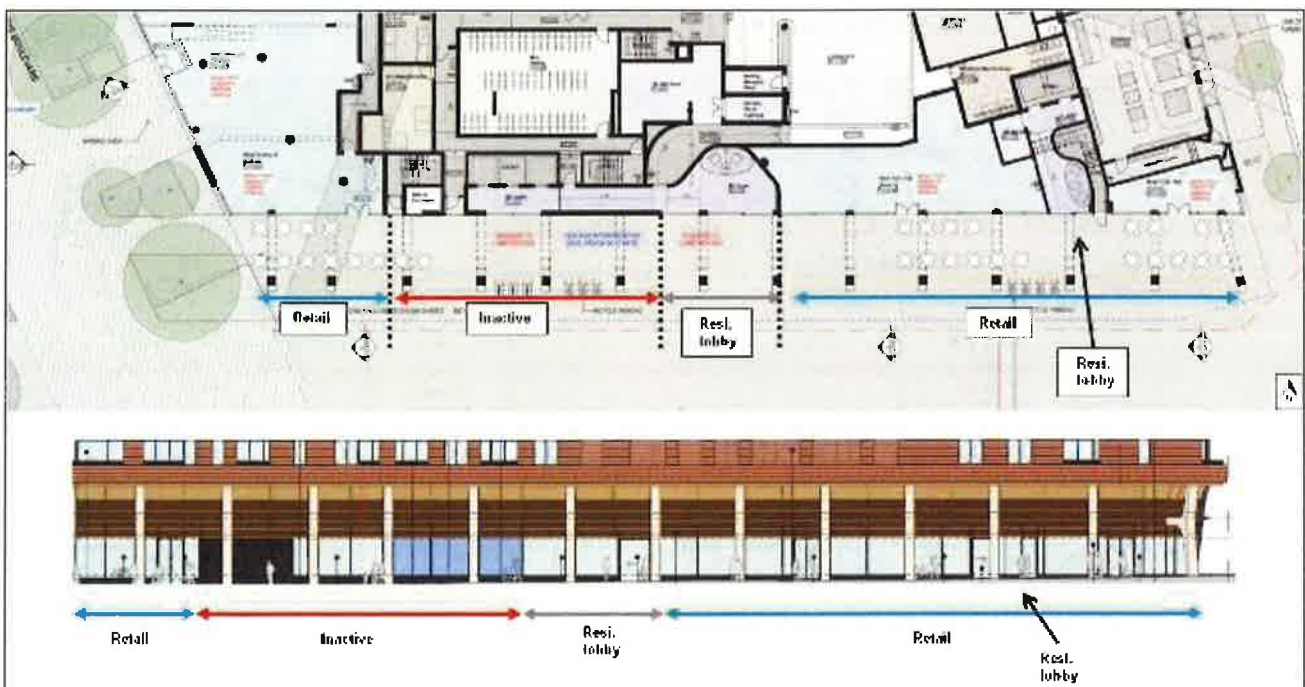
The amended ground floor level undercroft layout and elevation including the location of proposed uses and inactive areas (Base source: Applicant's Addendum).
